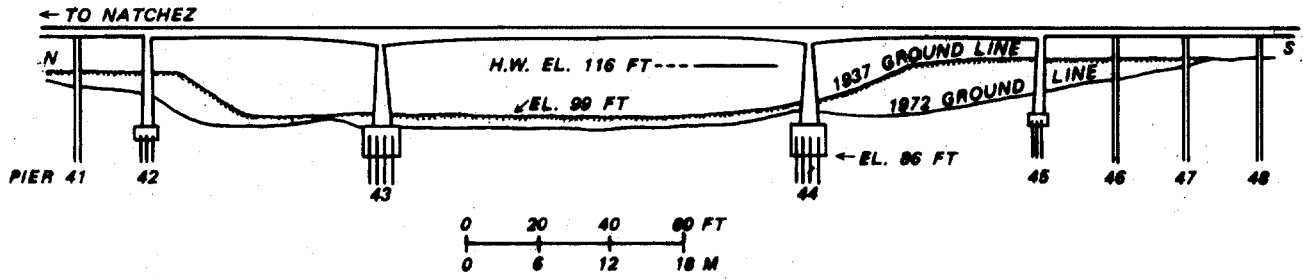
Elevation sketch of US-61 bridge, Buffalo River.
